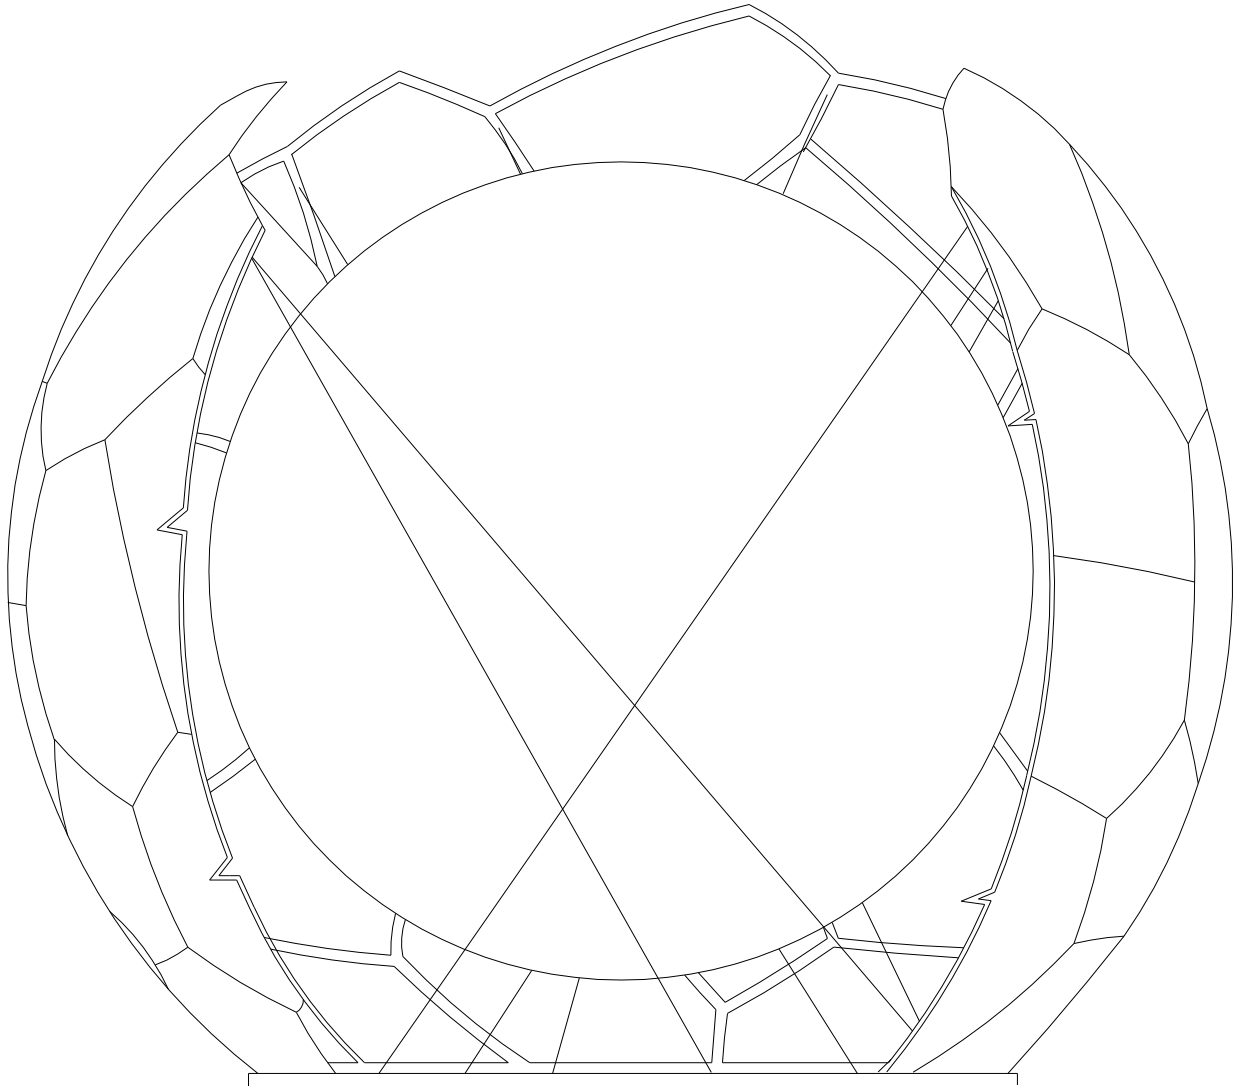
Radome Guying Against High Winds - Elevation Section
